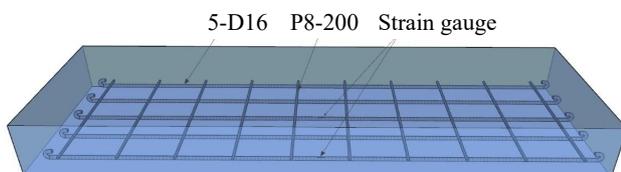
Placement of concrete reinforcement bar and strain-gauge sensors
